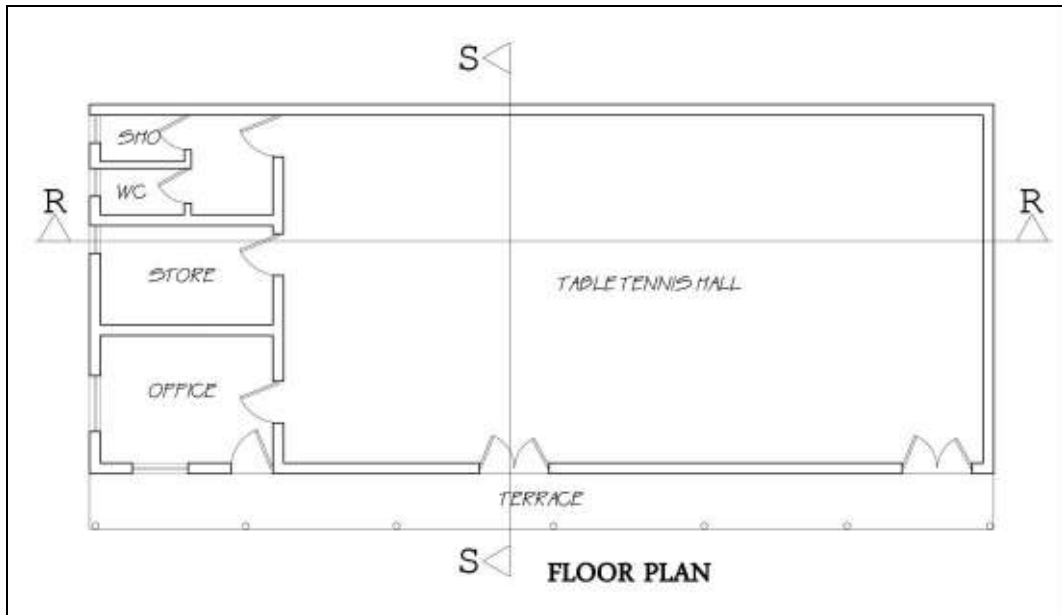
Showing ground floor plan of FUTA indoor Table Tennis hall.
